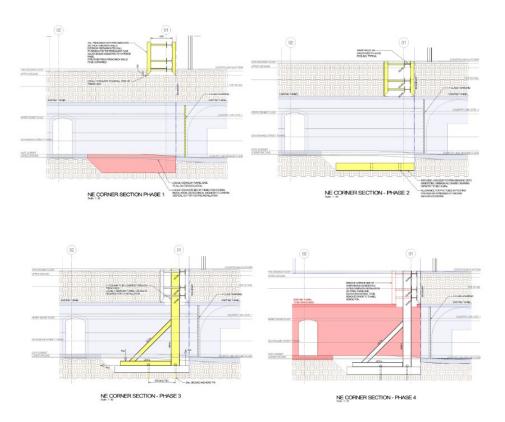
North East Baggage Tunnel Temporary Retention and Demolition
